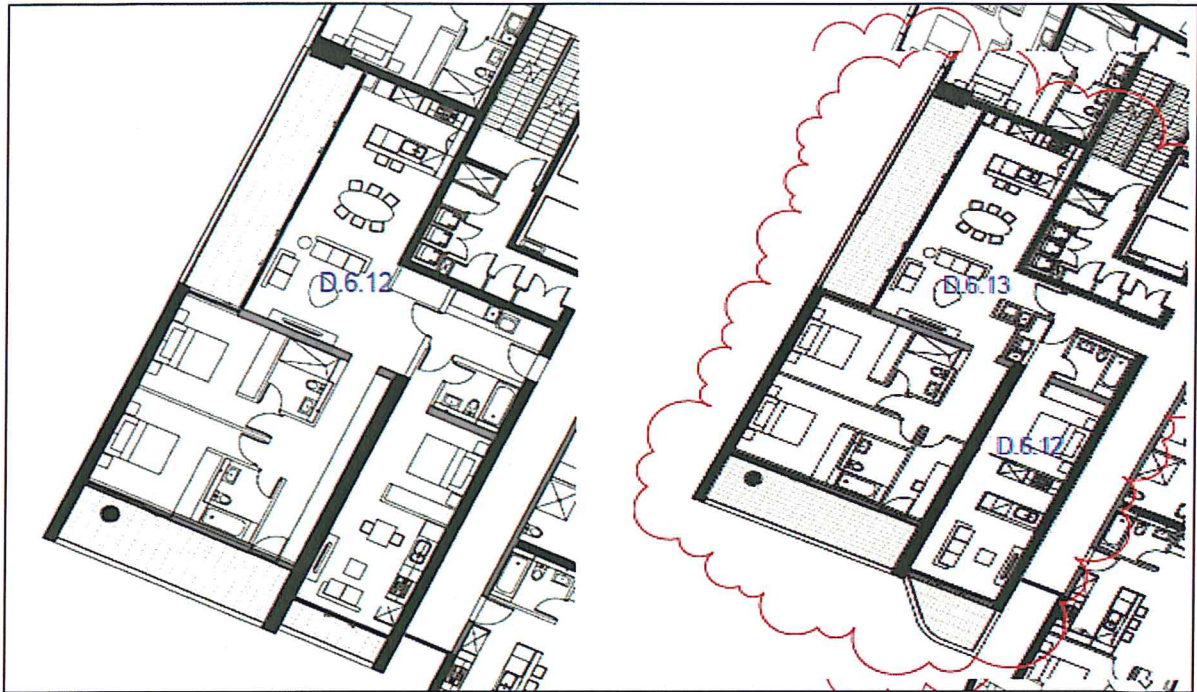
Approved (left) and proposed (right) Level 6, Building D
